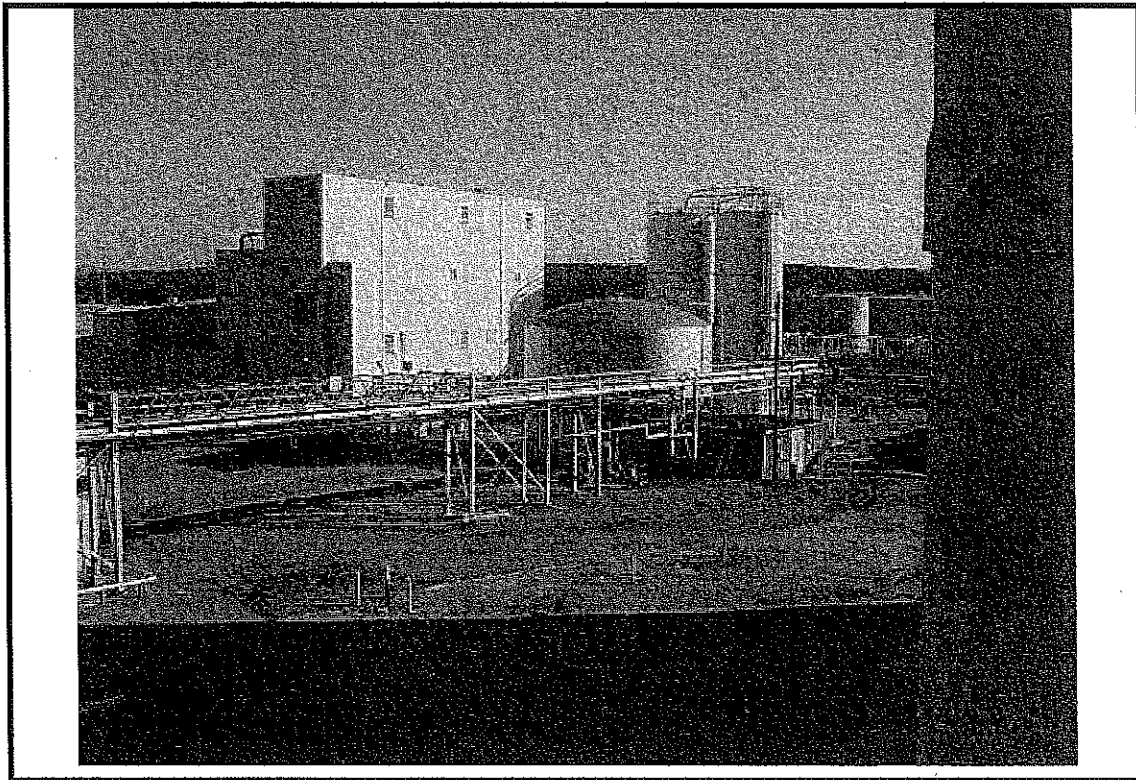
View of South Extrusion Building and Warehouse. View to Southeast.
